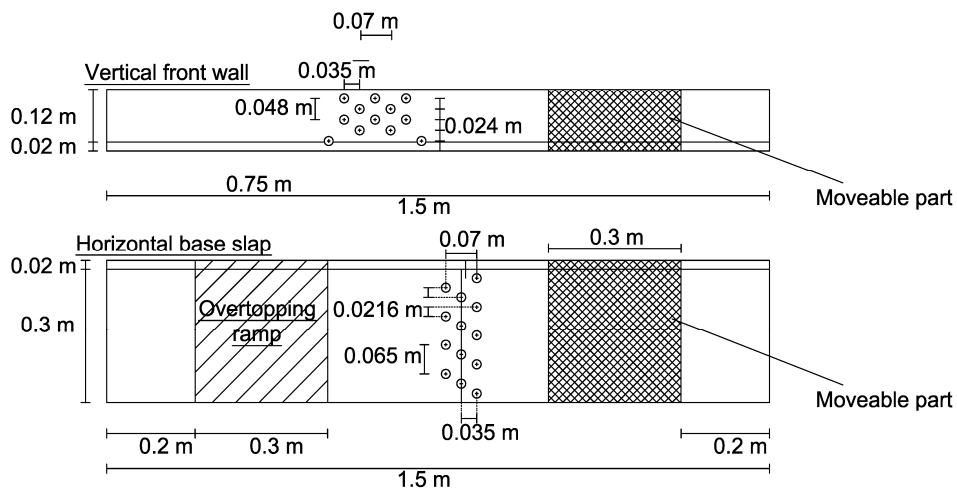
Detailed illustration crown-wall superstructure with attached measuring equipment.
